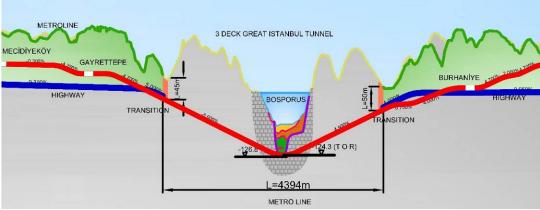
Alignment Profile of the Bosporus Crossing (author)
